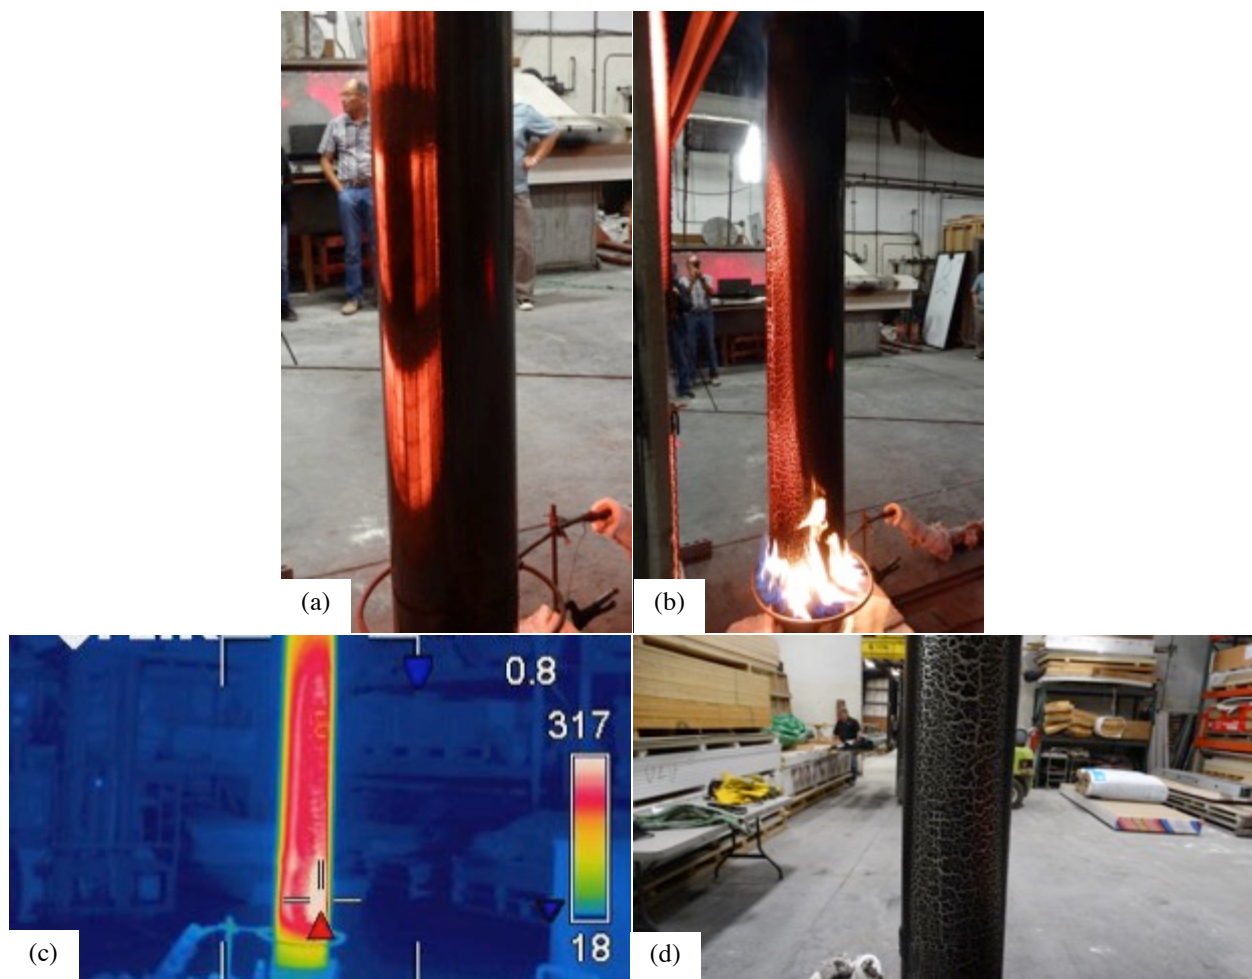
Test 3 showing (a) smoking, (b) ring burner, (c) IR in wind, and (d) after test.
